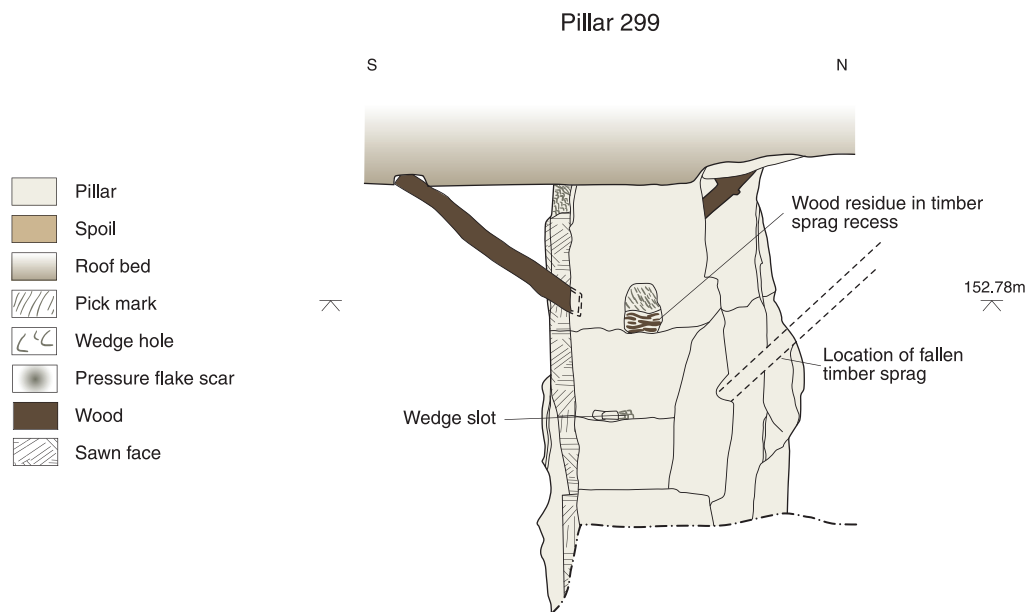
Section of pillar 299, showing timber sprags from pillar supporting the roof
